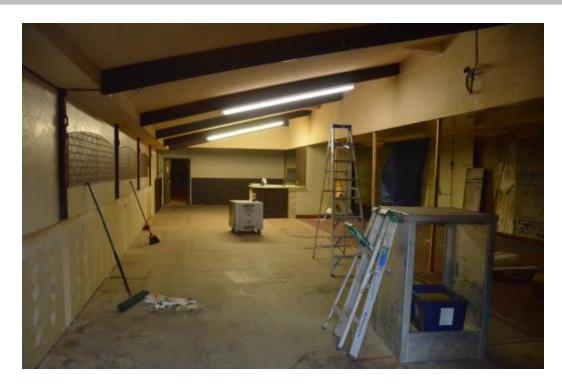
Storage Room at Rear of Retail Bays (South End)
